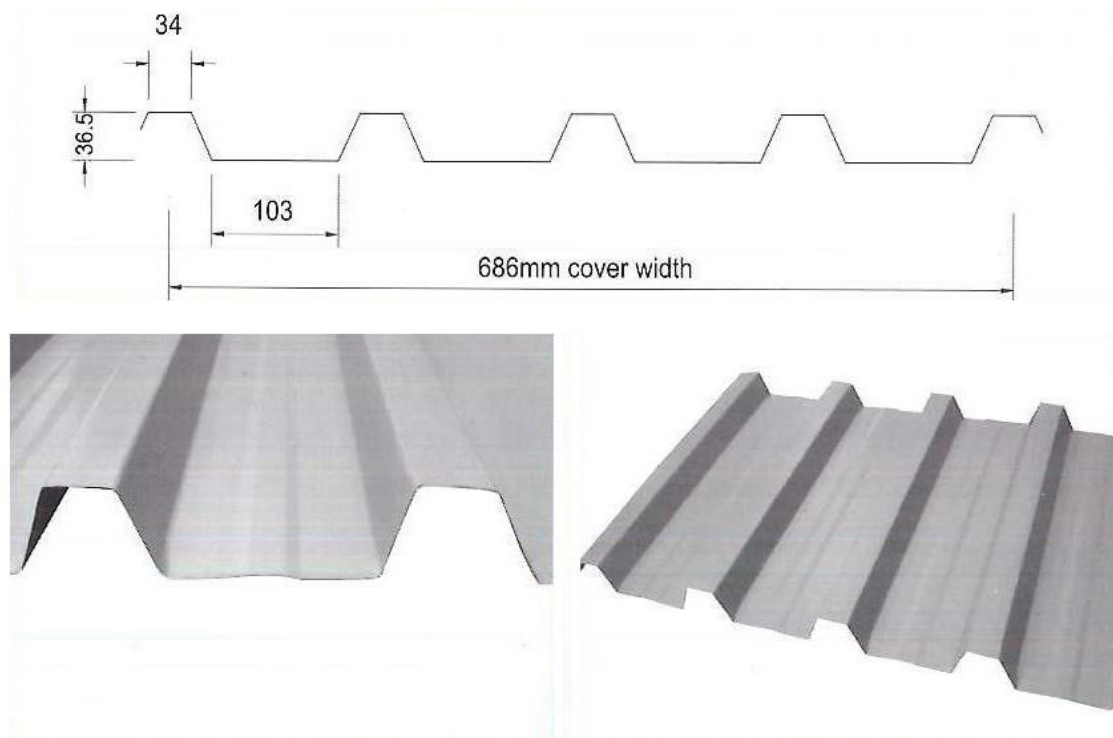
Picture and standard profile dimensions of the IBR686 roof sheeting [3]
